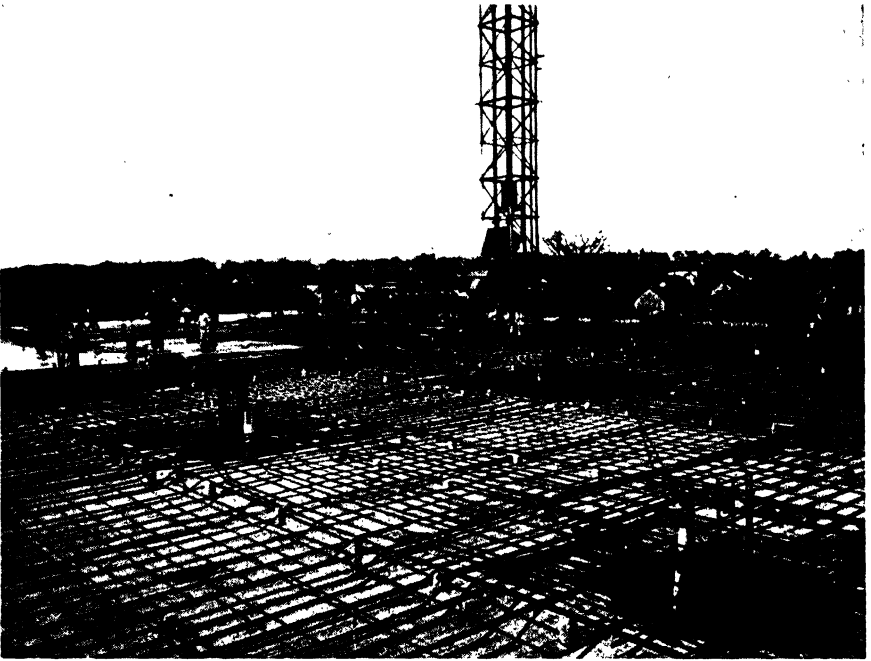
Tower Skips to Buggies. (Courtesy Aberthaw Construction Co.)
